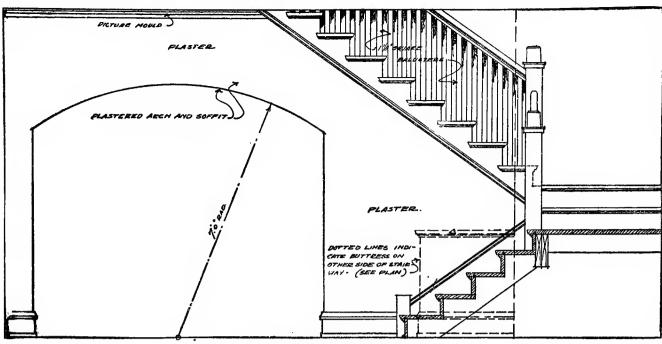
WALL, WINDOW AND PORCH DETAILS
